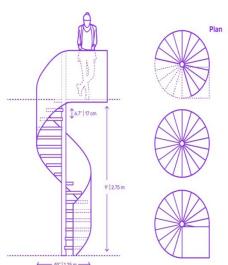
Practical applications of a helix – screw, bolts, springs, gears, spiral staircase
